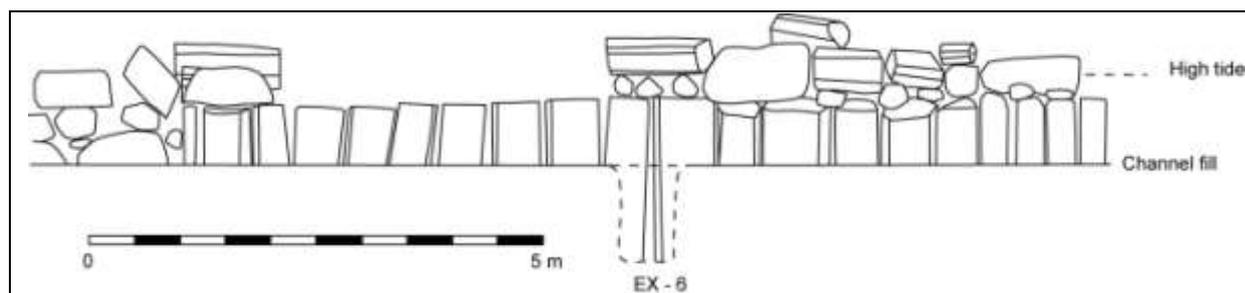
Profile of the section of the southern retaining wall of Nan Dawas characterized by vertical trapezoidal stones. The result of excavation 6 is included in the figure.
